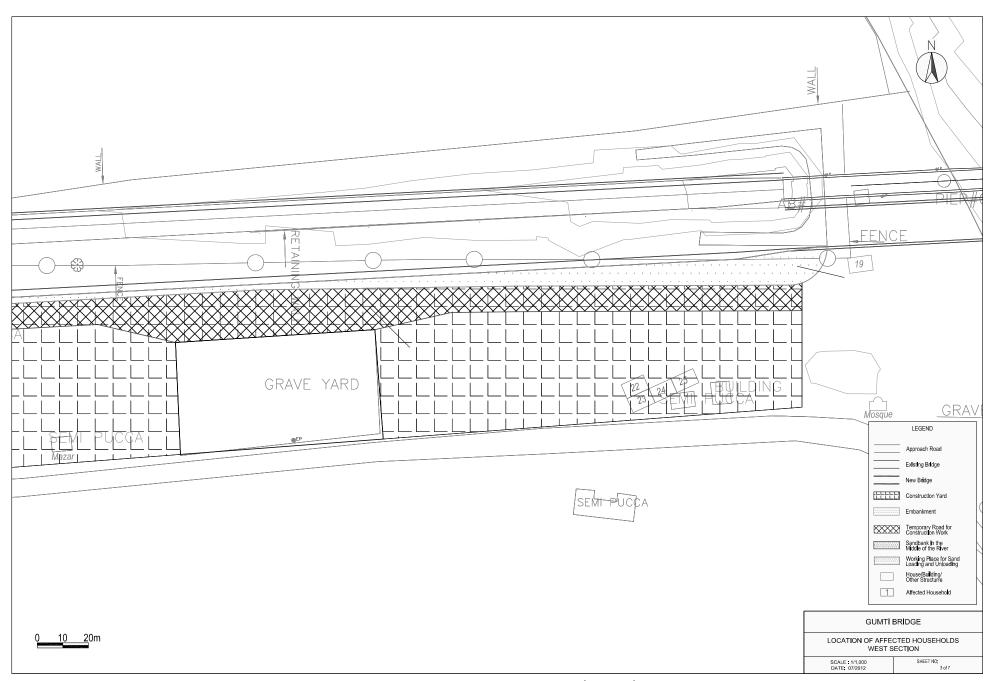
Location of Affected Households West Section (Sheet No.3)
